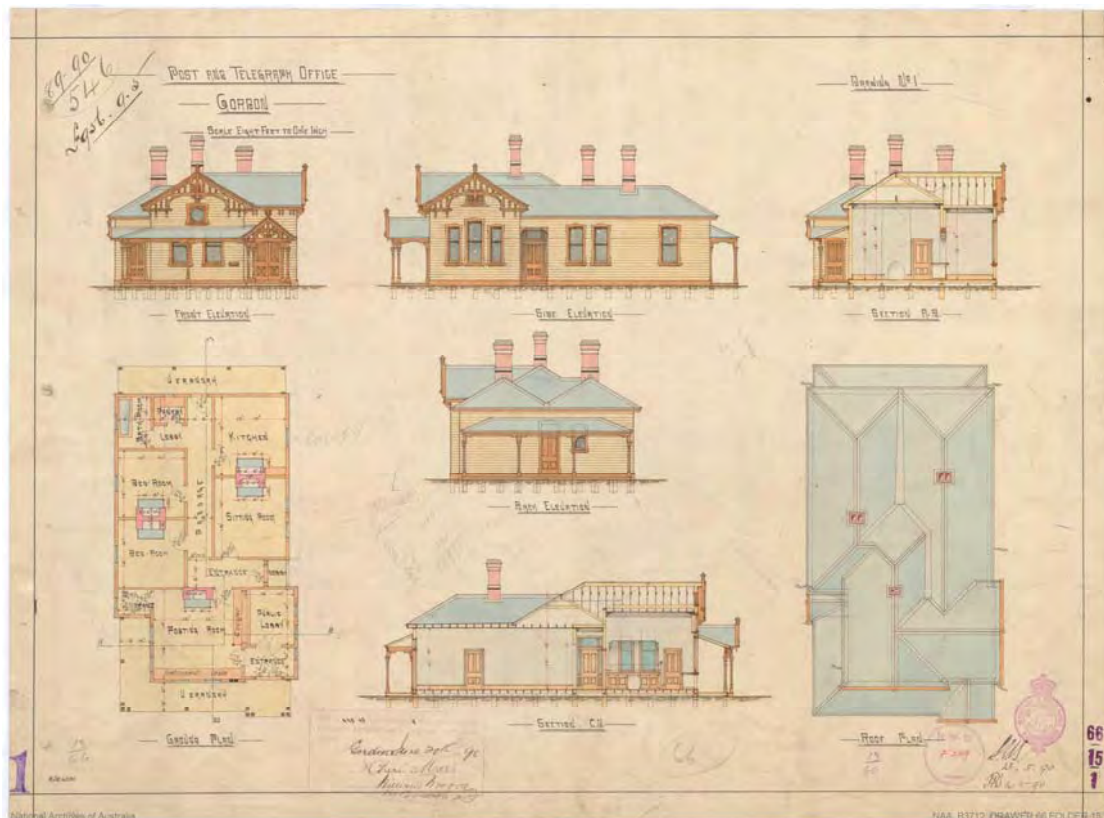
Victorian Public Works Department, Proposed Gordon Post & Telegraph Office, Floor and Roof Plans, Elevations & Section drawings, 23 May 1890. Source: National Archives of Australia, Series B3713, drawer 66 folder 15.
